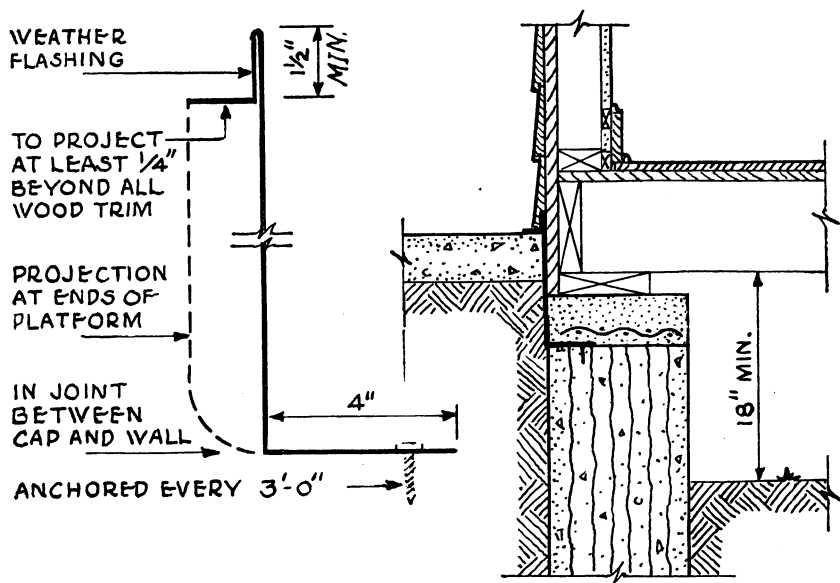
Metal apron inserted between concrete slab and woodwork, anchored to unit-type foundation, and capped with reinforced concrete. The apron serves as a weather flashing as well as a termite barrier.
